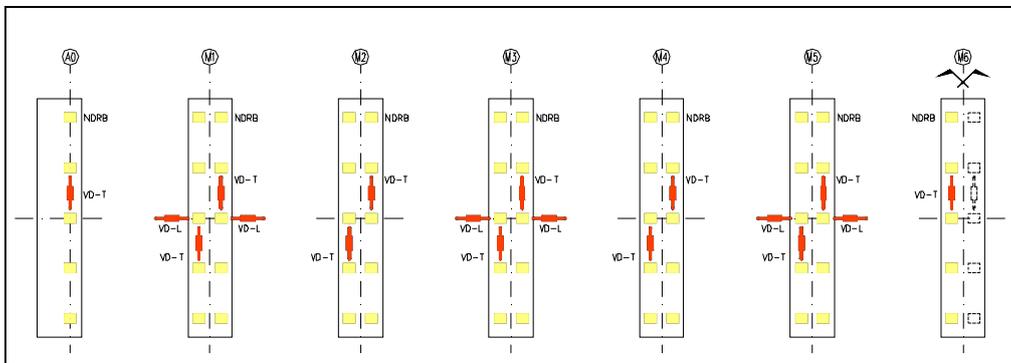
Seismic isolation system arrangement sketch. There are 10 rubber bearings and 2 transverse dampers on each pier (5 and 1, respectively, on abutments), and 2 longitudinal dampers on every second pier. Half the bridge is shown, as the arrangement is symmetrical in the other half.
